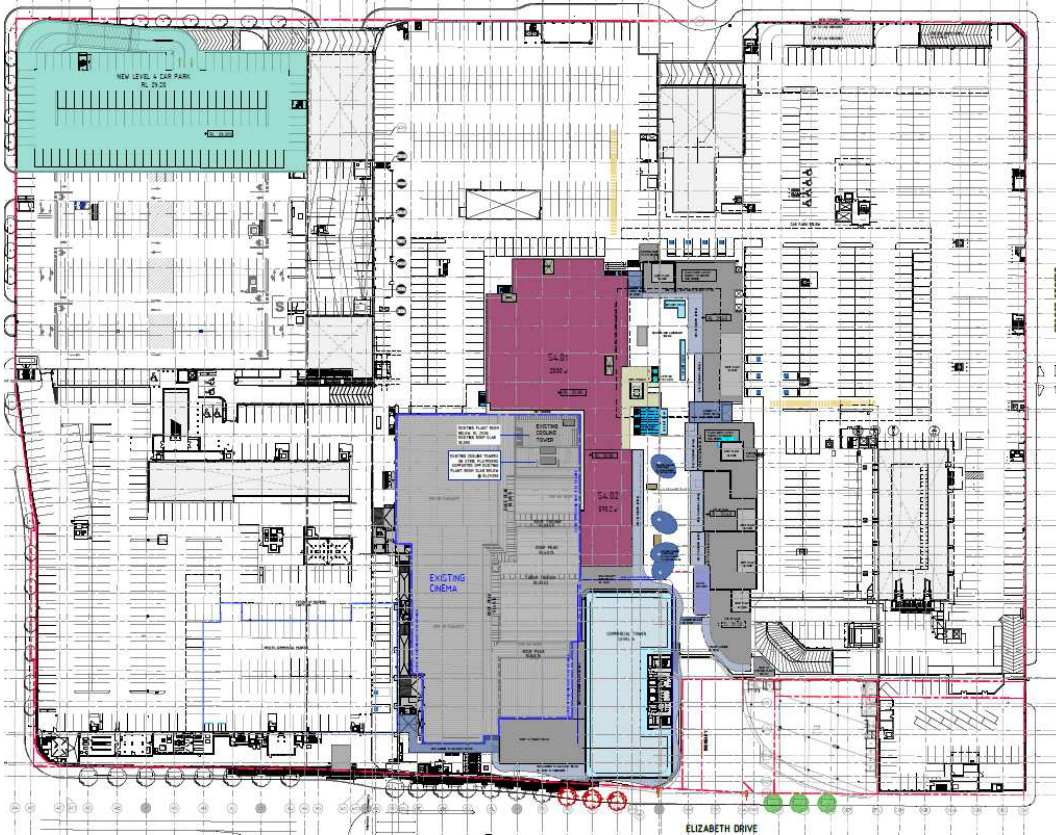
Plan showing the proposed new construction on Retail Level 4
